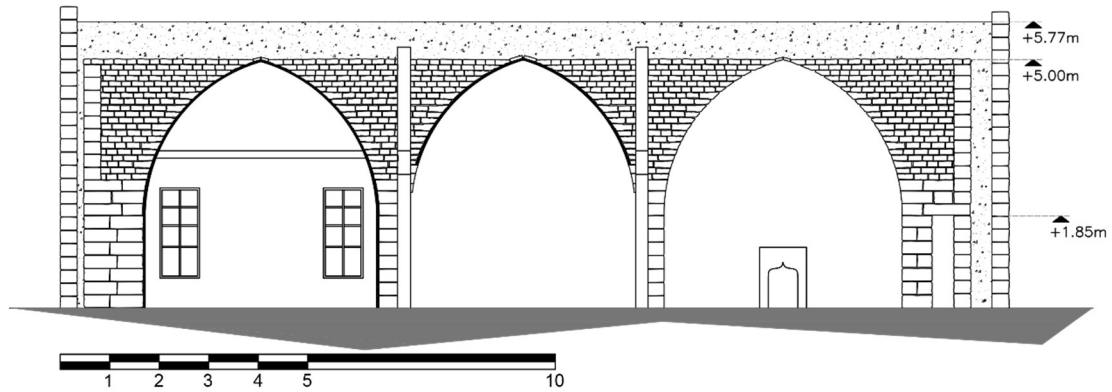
Technical Section of Vaulted Mokhtara Roof Liwan House, Source: Author
